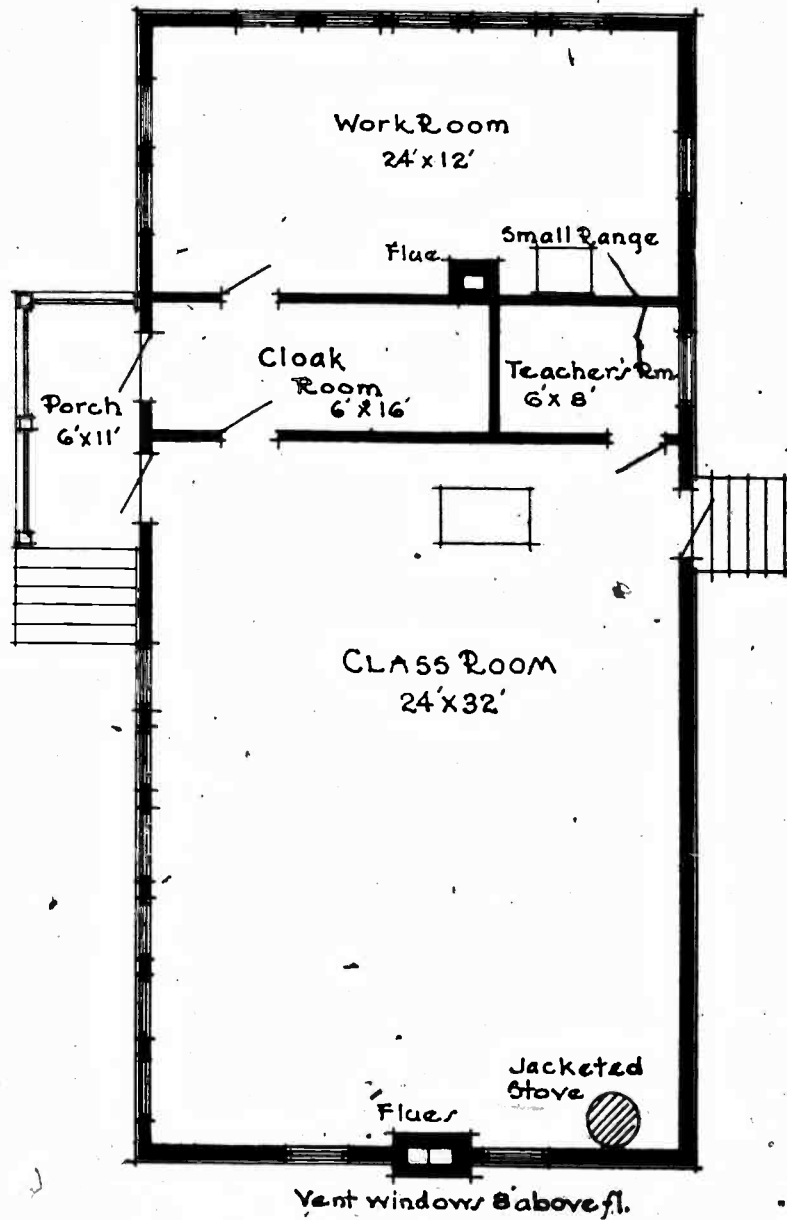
Floor plan, one-teacher rural school, York County, S. C.
